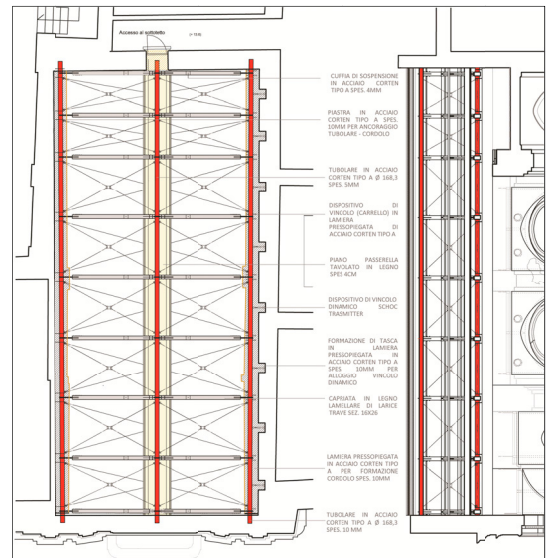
Plant and longitudinal section, carpentry of the roof.
